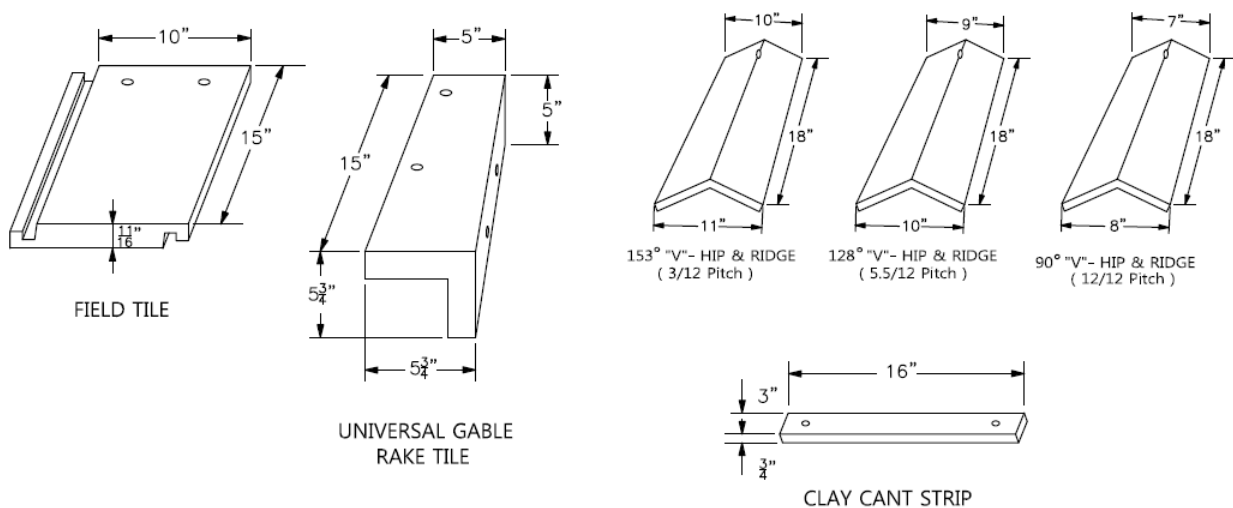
PLACER INTERLOCKING CLAY ROOF TILE
